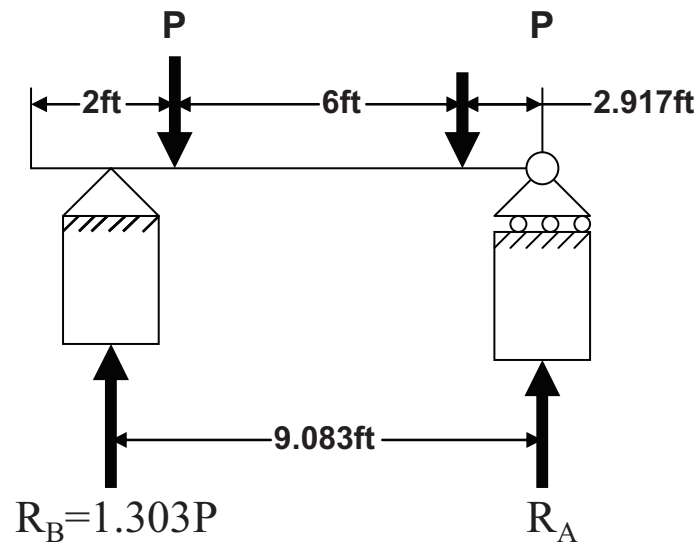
Exterior Girder Moment Distribution Factor
